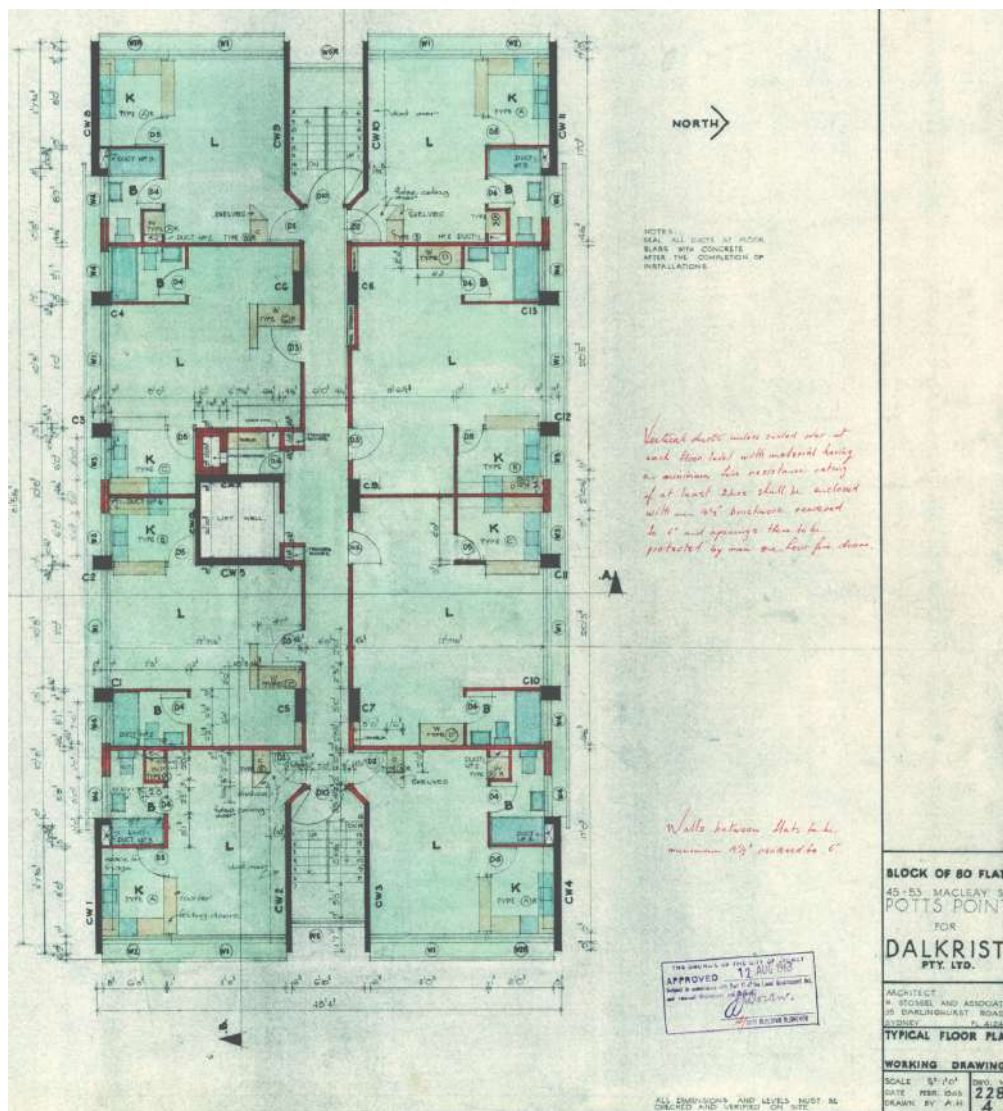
Plan of a typical floor layout of residential flats of the implemented design of March 1963 designed by Hugo Stossel for Dalkrist Pty Ltd.
